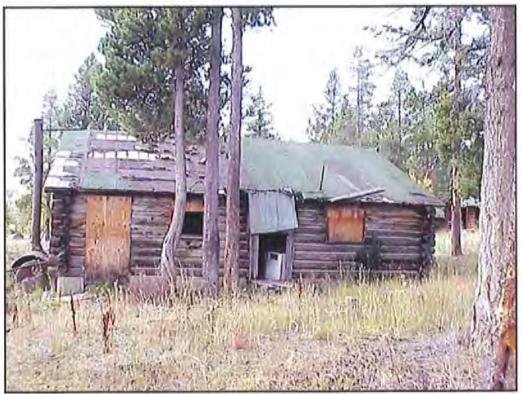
North wall of HS-1162, the Bathhouse. Source: A&E Architects, 2004.
